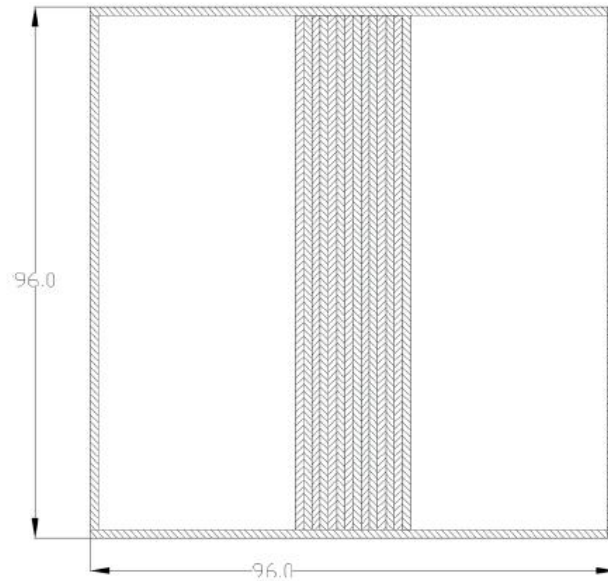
Centrally located studs for a 27% framing factor at 8×8 ft (2.44×2.44 m) wall.
